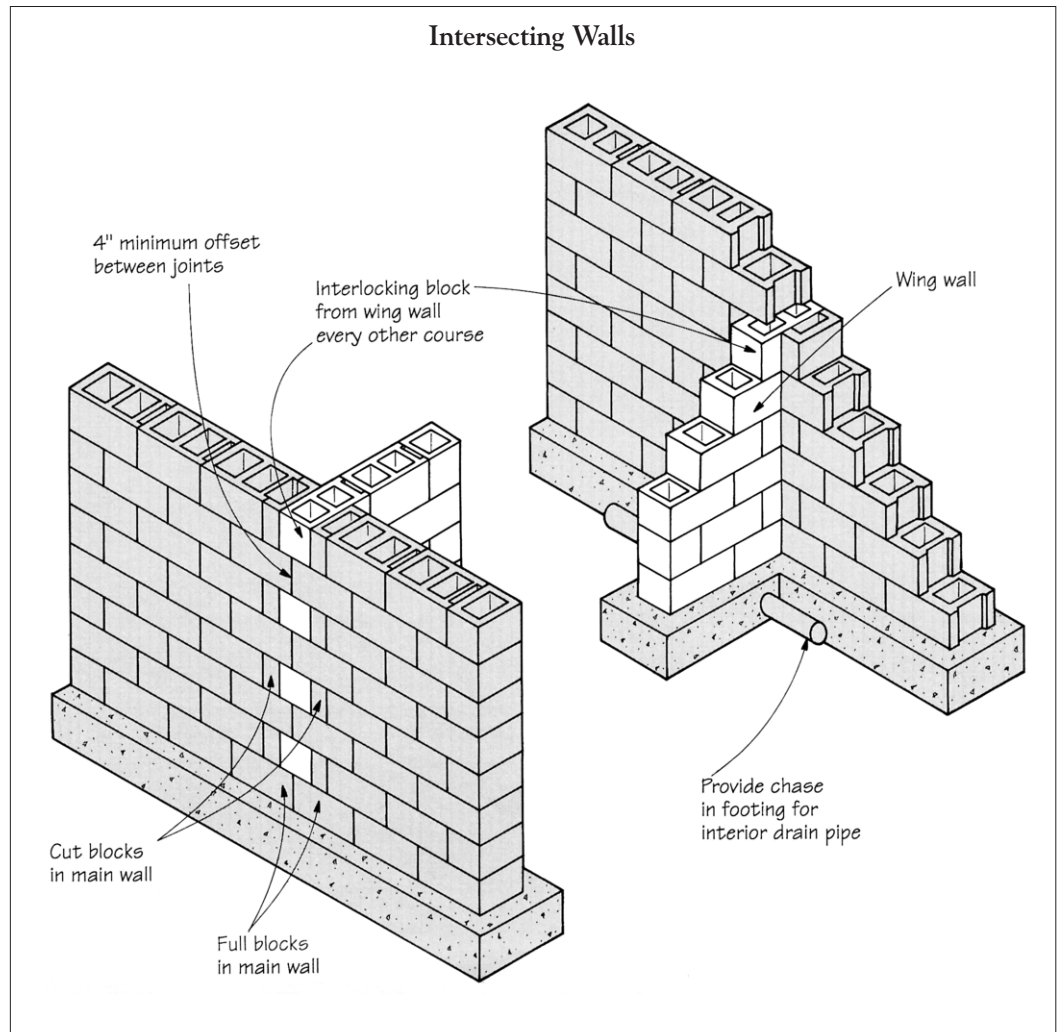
Where walls intersect, the blocks must interlock. Layout is more difficult with walls of different widths, but all joints should still be offset by 4 inches or more.
